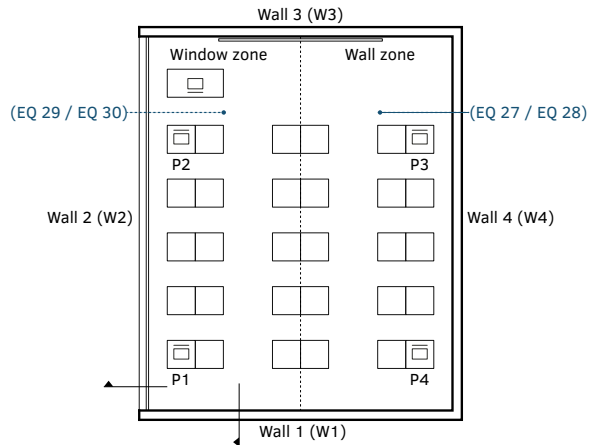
A typical classroom² setting with walls and four critical sitting positions – P1, P2, P3 and P4 and zones, studied in this research.
